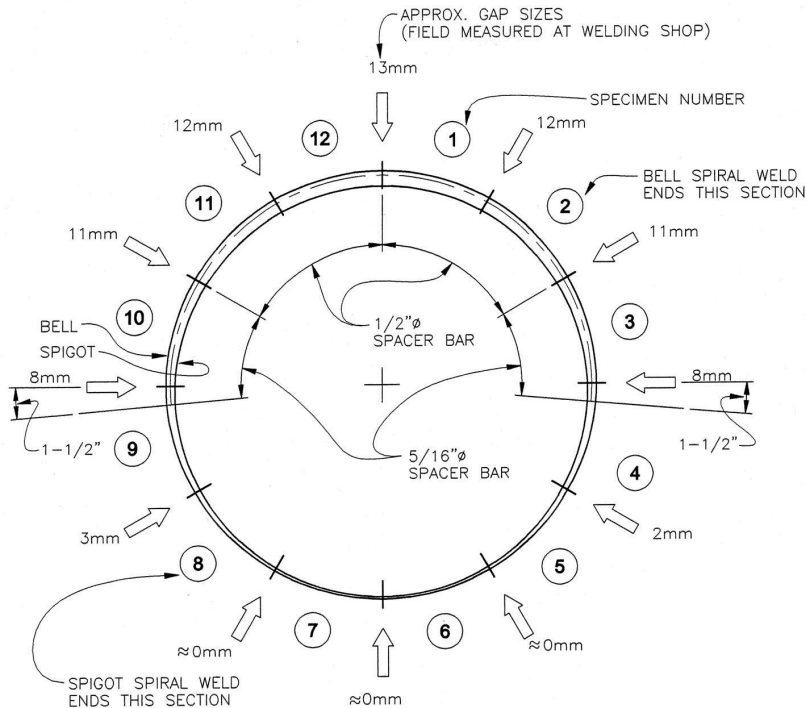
Bell and Spigot Joint Fabrication Misalignment
